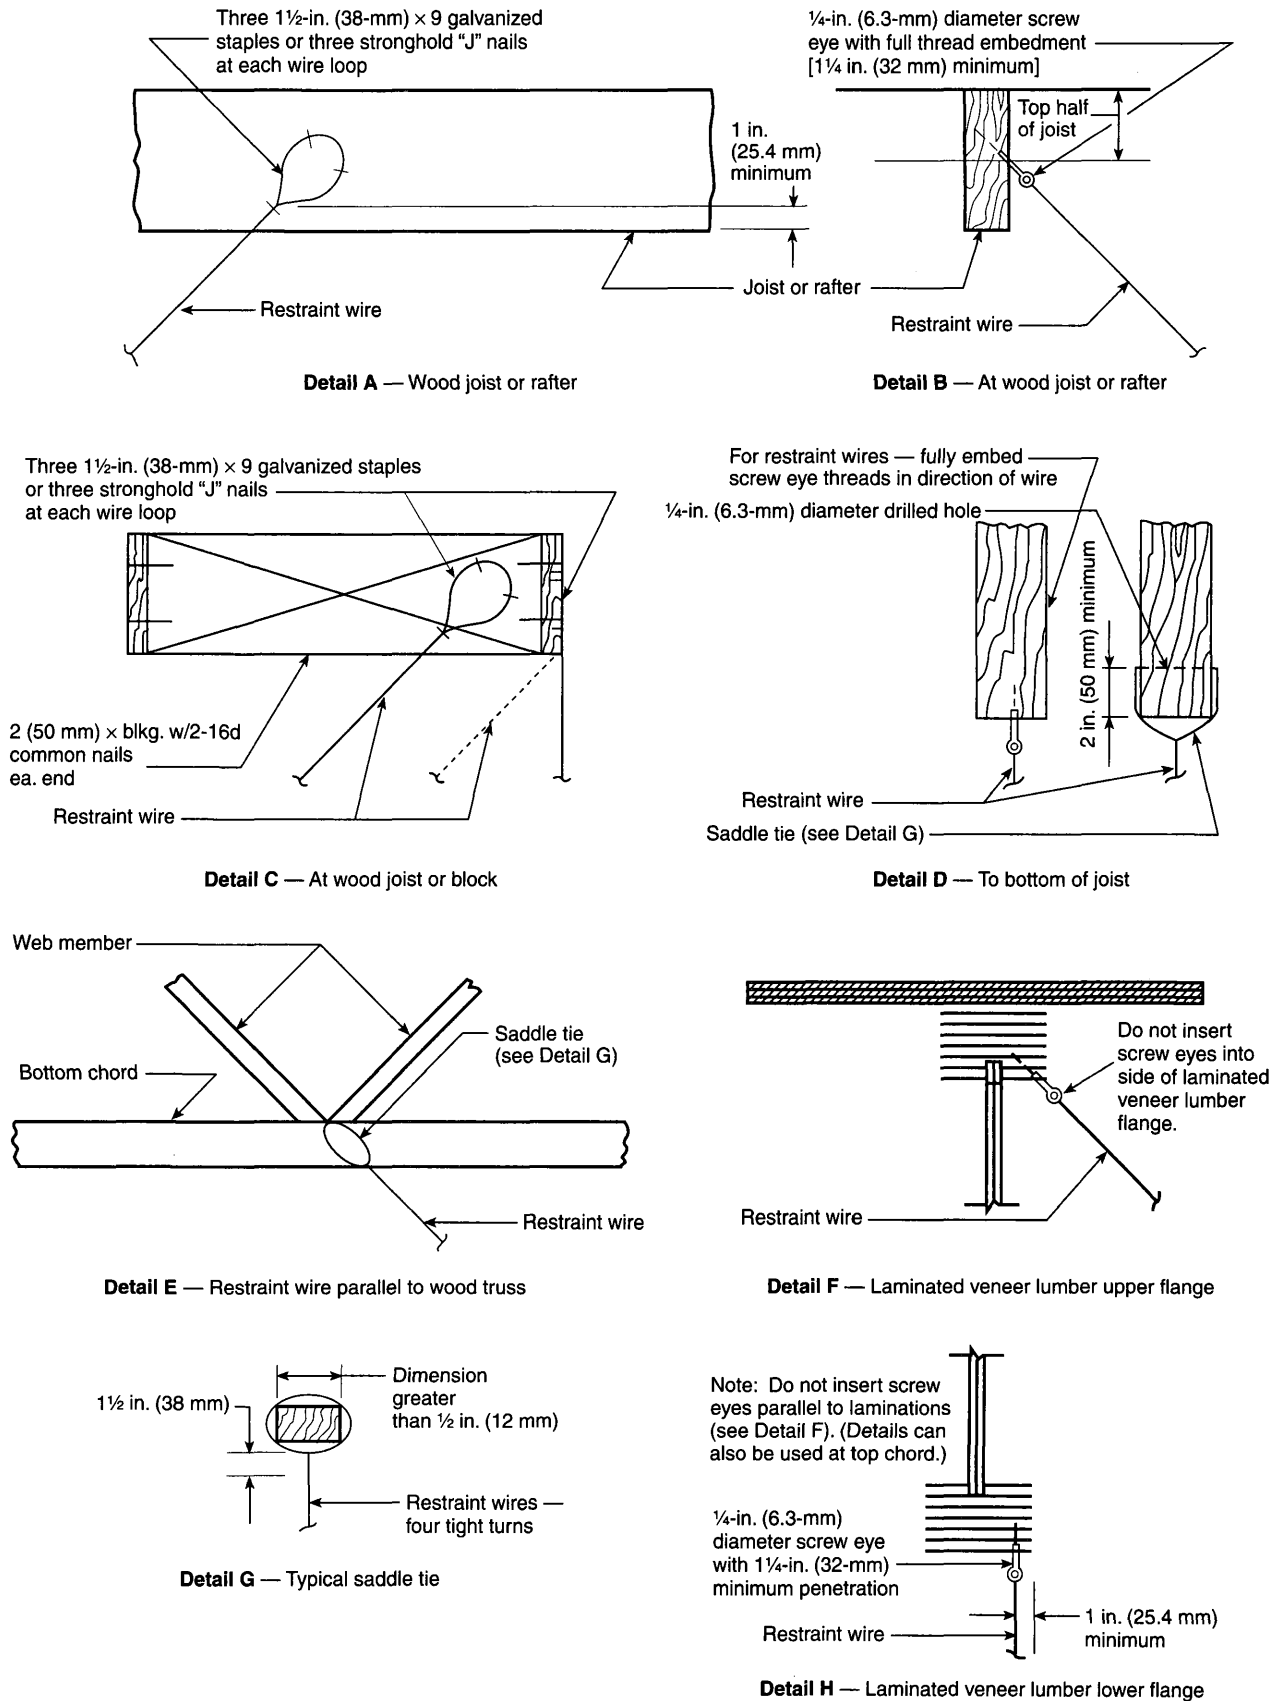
(d) Acceptable Details — Wire Connections to Wood Framing.
